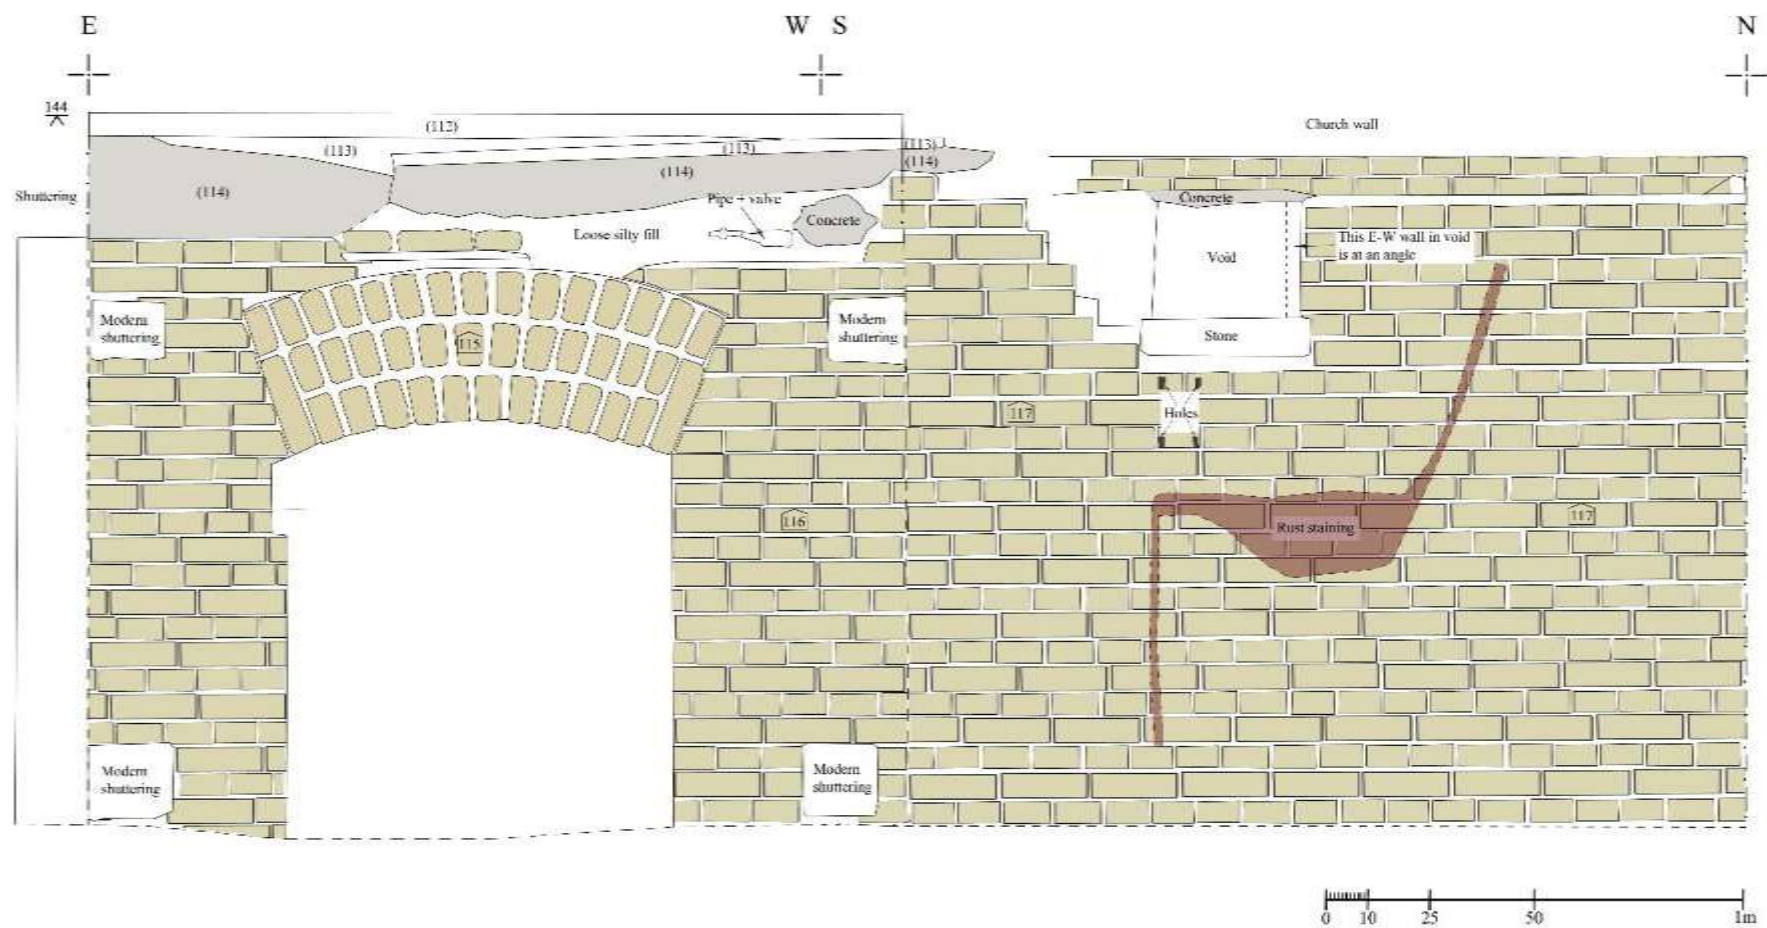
North and east facing sections of dropshaft 15, showing basement leading to coal cellar. Original drawn at 1:10.
